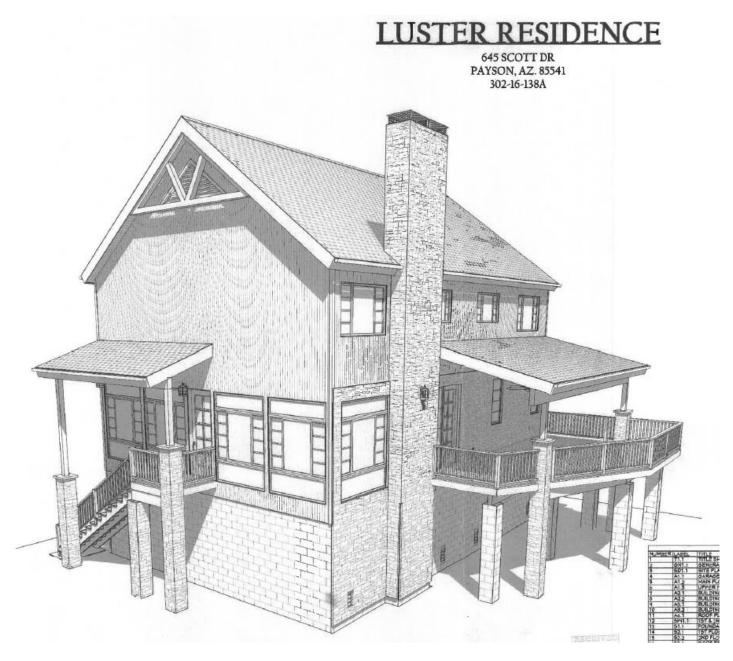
Rendering of the Luster Home Provided with Building Permit Submittal
